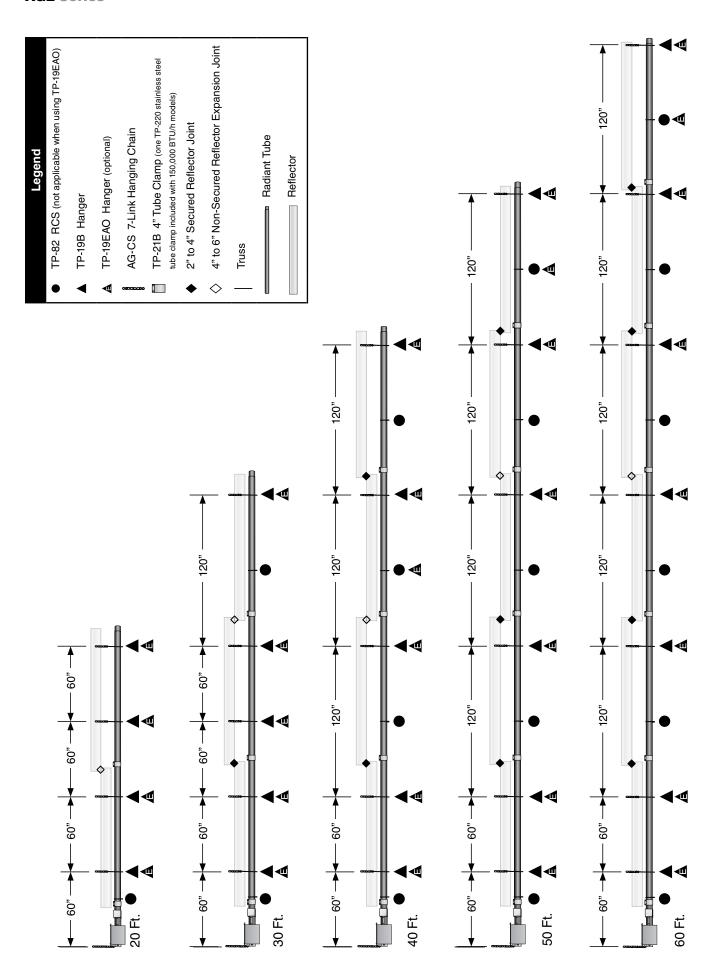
• Heater Suspension Layout • Five (5) Foot Truss Mounts
